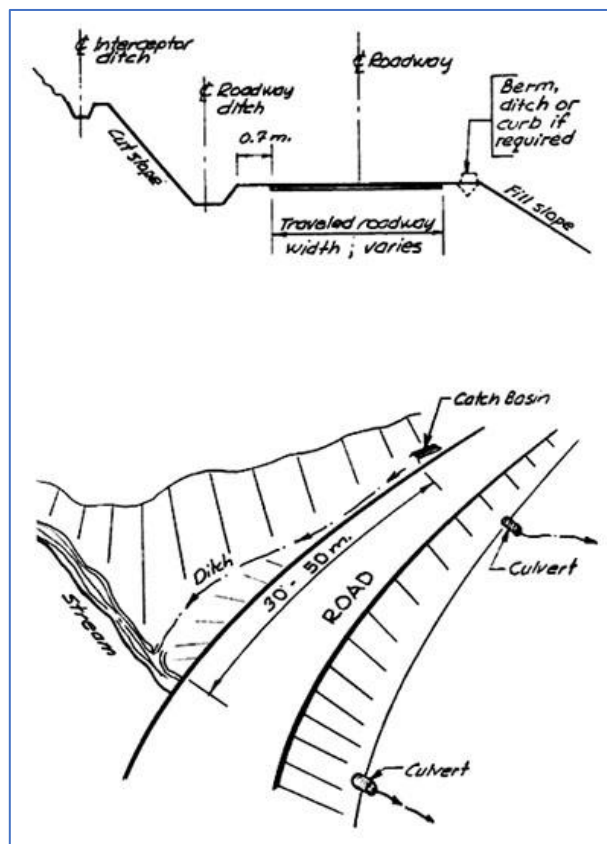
Road construction grading patterns used to control surface drainage
